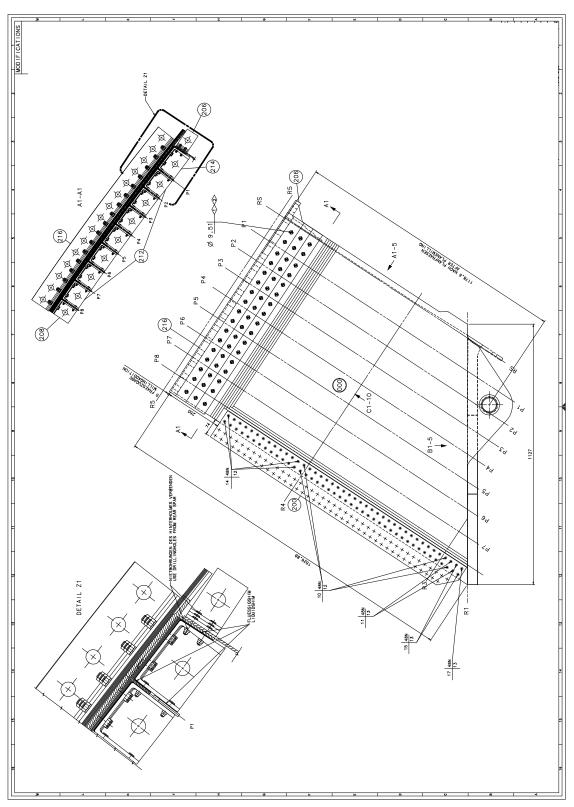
LHS Lug Test#2 specimen drawing [outside view]
